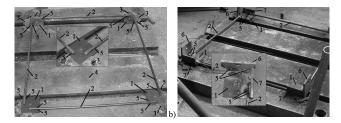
Production of flat steel skeleton of the frame space module: a) forming a frame size; b) production nodes; 1, 6, 7
